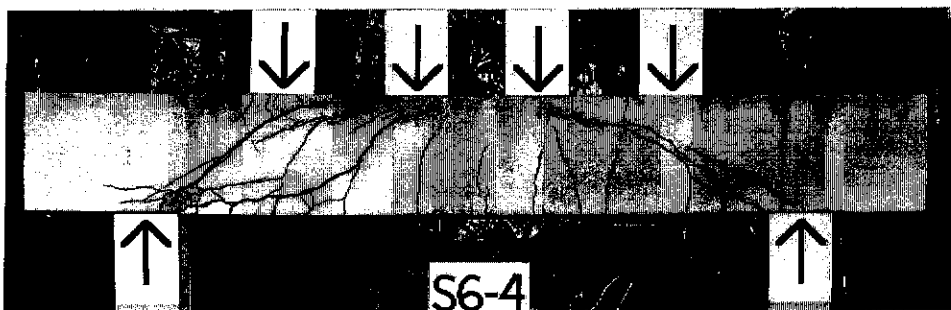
Crack Pattern of the Back Face of Beam S6-4
